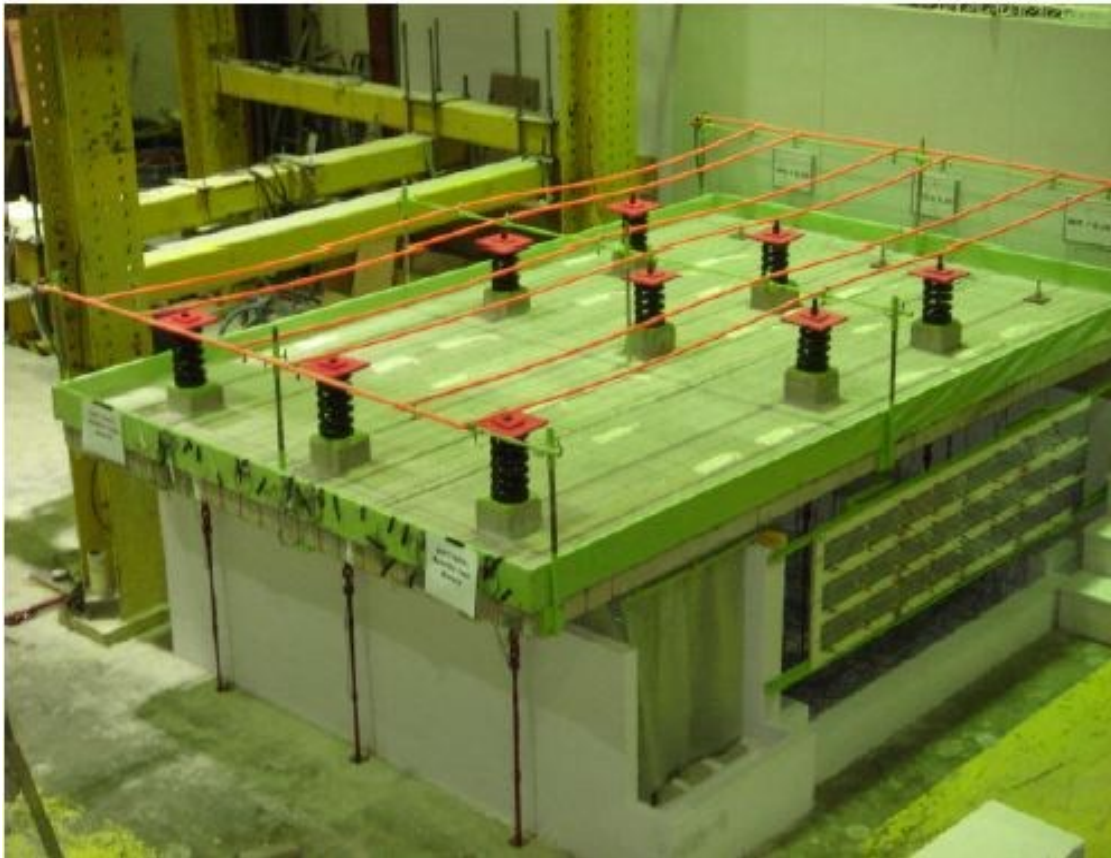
Reinforced concrete deck on which measurements were taken (reproduced from Deif 2010).
